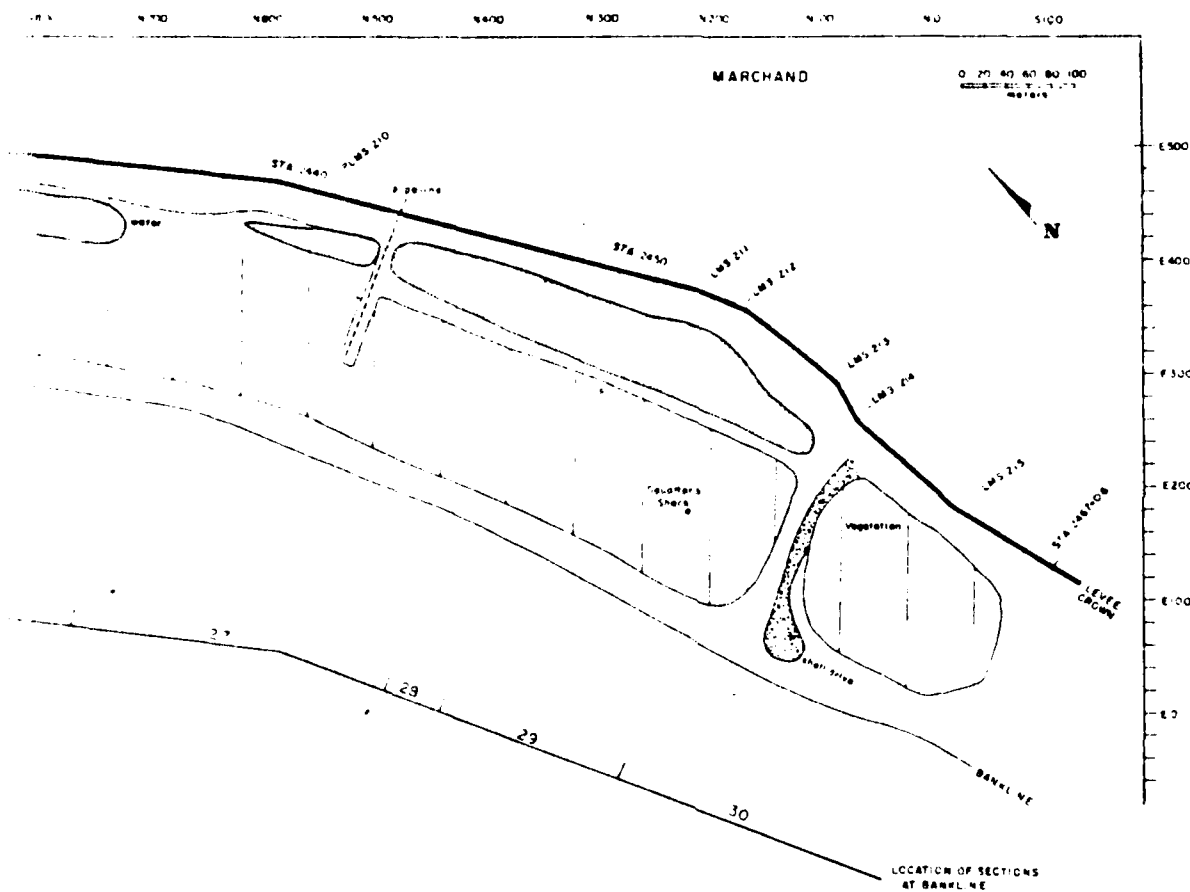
SITE PLAN OF THE MARCHAND SURVEY AREA
